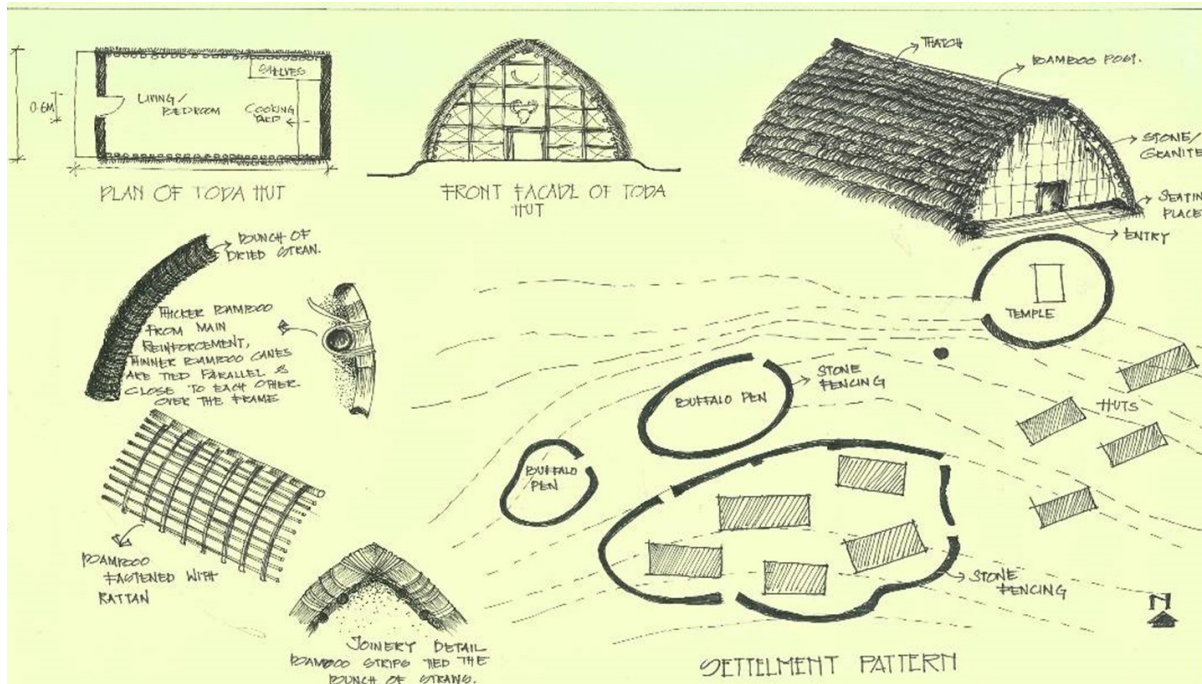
Settlement plan and typical layout with construction details of Toda settlement at Manjakal. Source: Author
